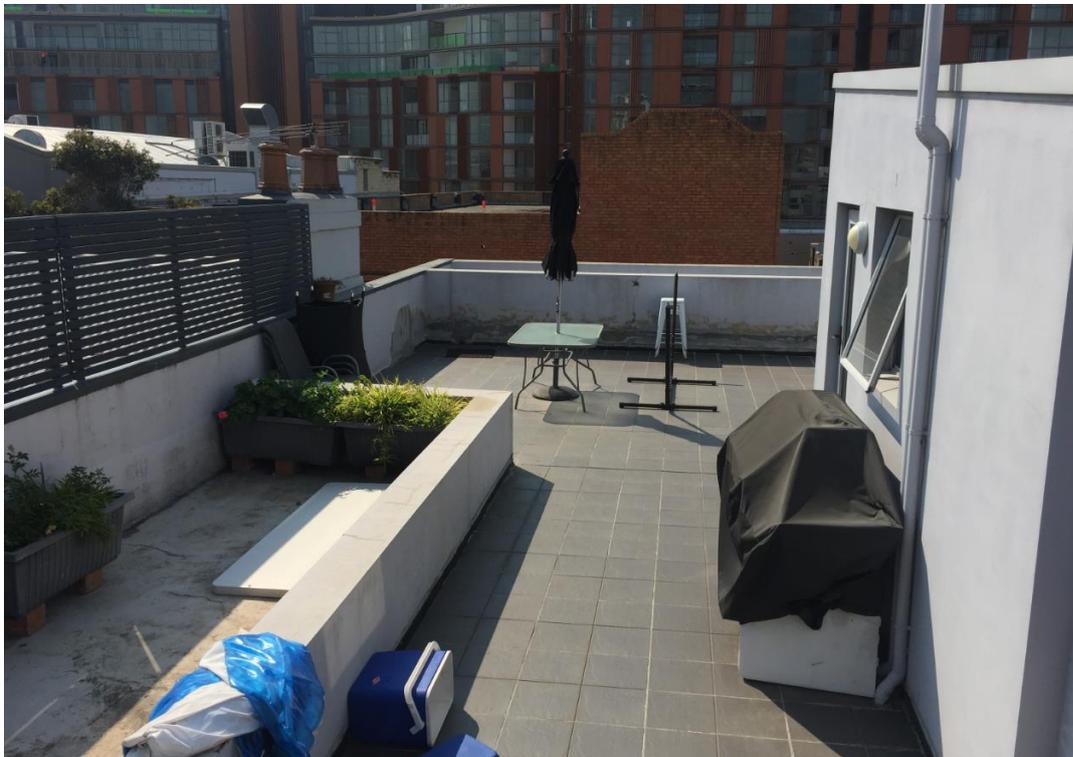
Part of the existing communal private open space located at the western edge of the building, looking north.
